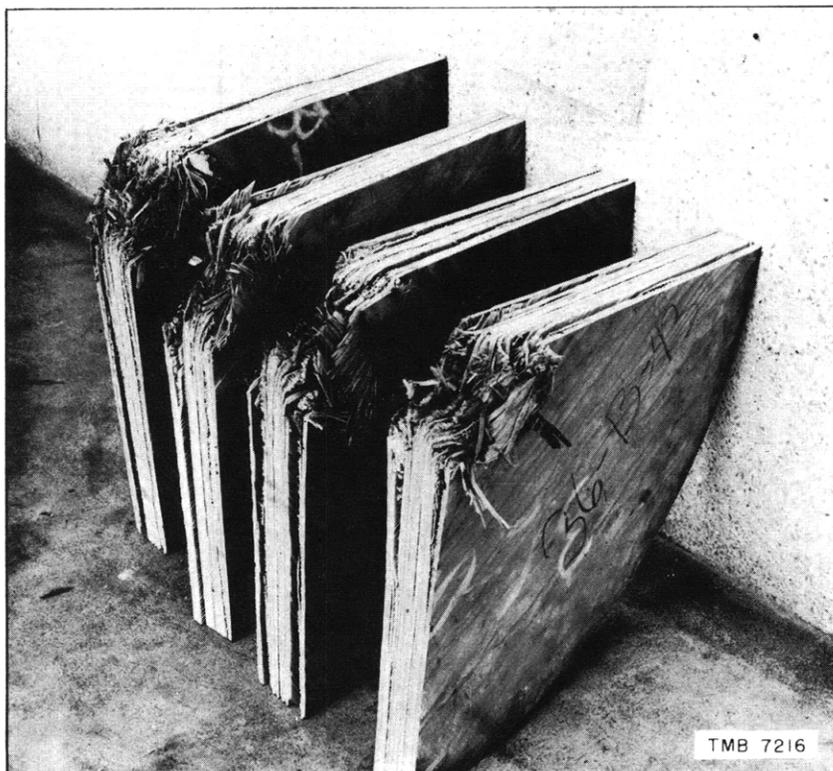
Sections of 2-Inch Plywood Filling after Test BW
